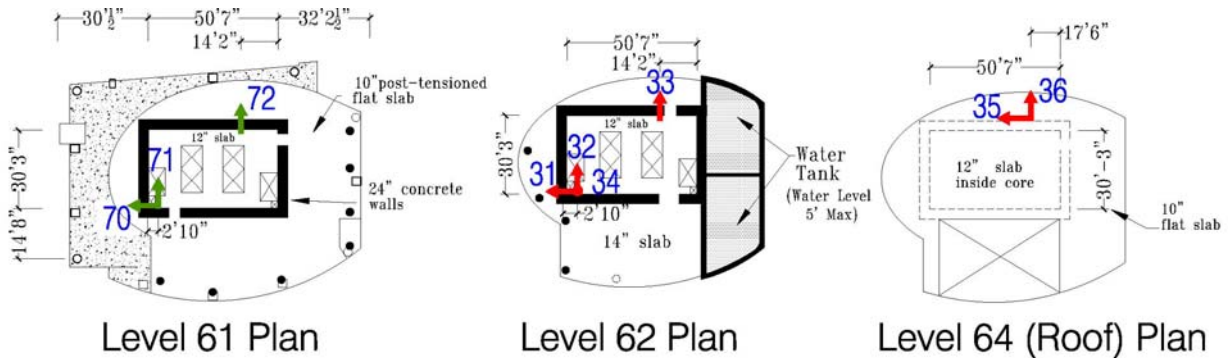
Sensor Locations at Levels 61, 62 (with water tank) and 64 (roof).
